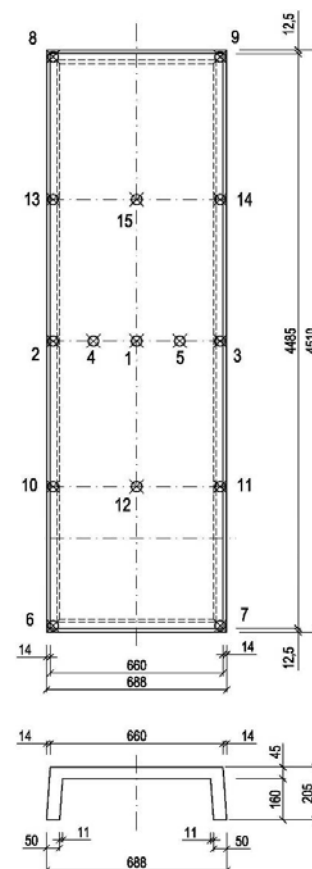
Scheme of ferro-cement panel for floor or roof structure
